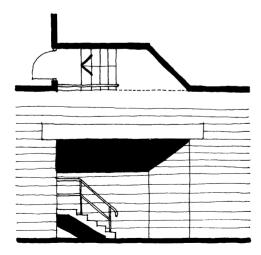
'Sub-space' off circulation route, plan/ elevation.
